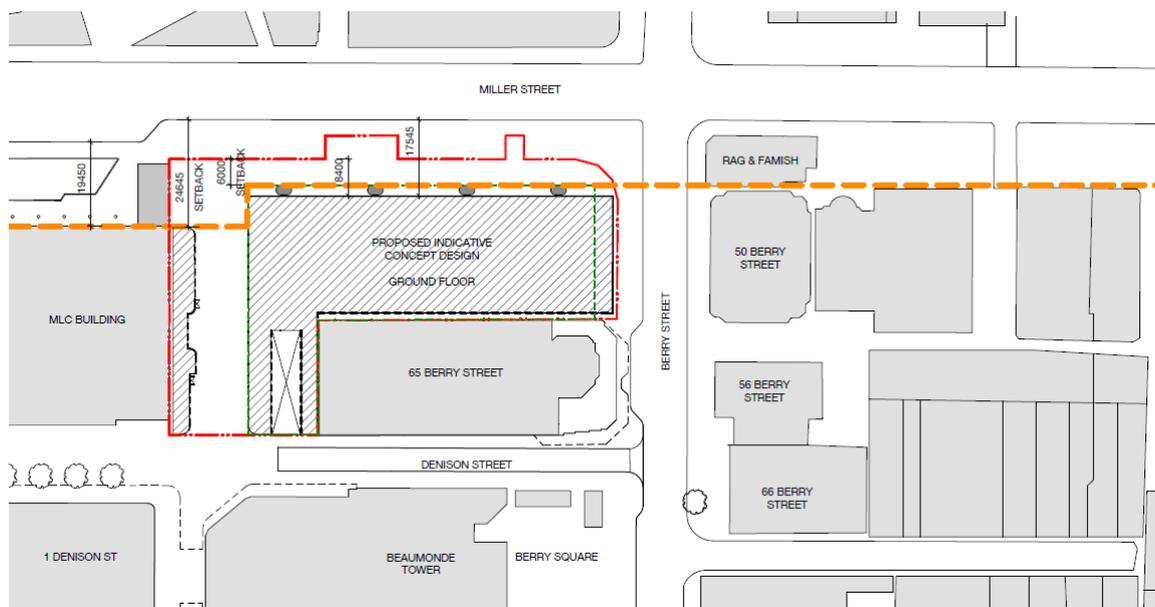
Victoria Cross building alignment (Miller Street)
